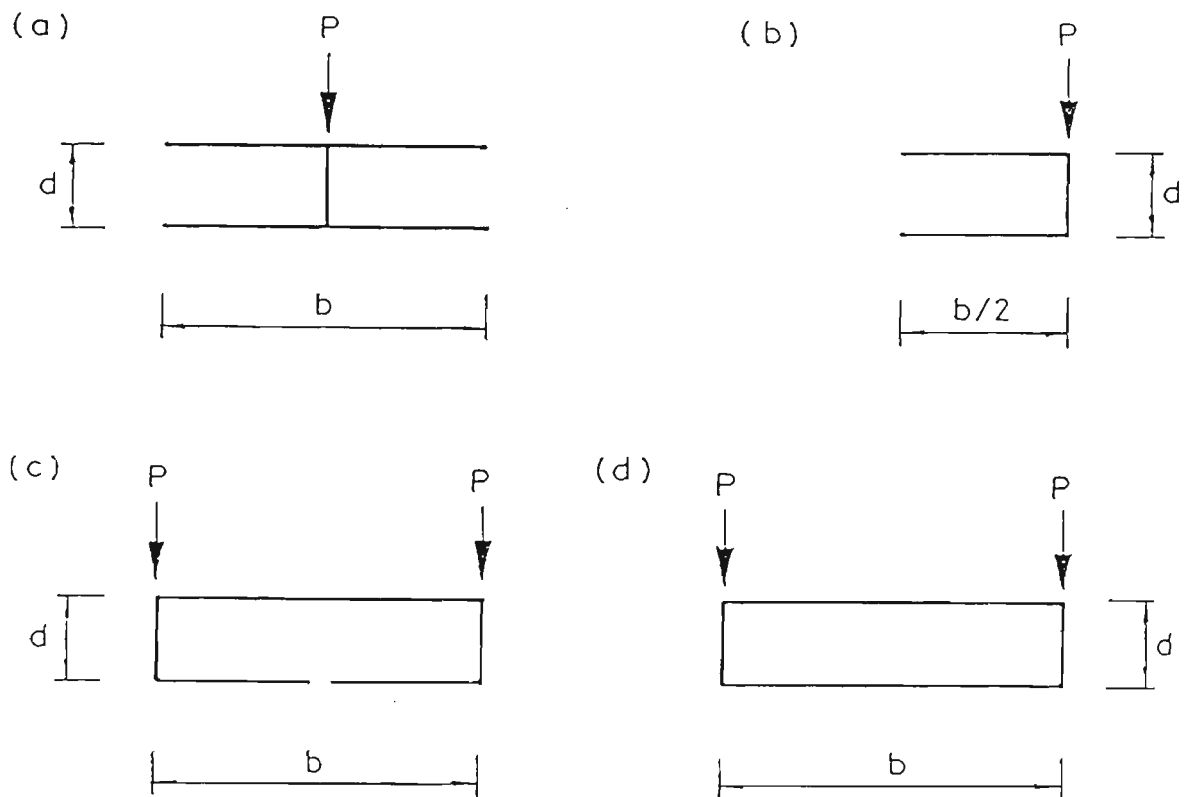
Cross-sections investigated; (a) wide flange I-beam; (b) channel; (c) open box girder; (d) simple box girder
